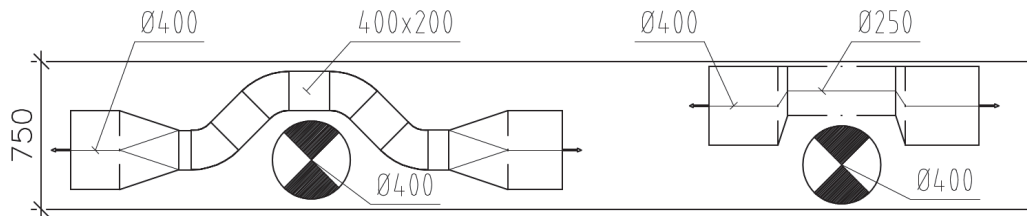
Changing rectangular crossing into round duct for a cheaper and faster installation.
